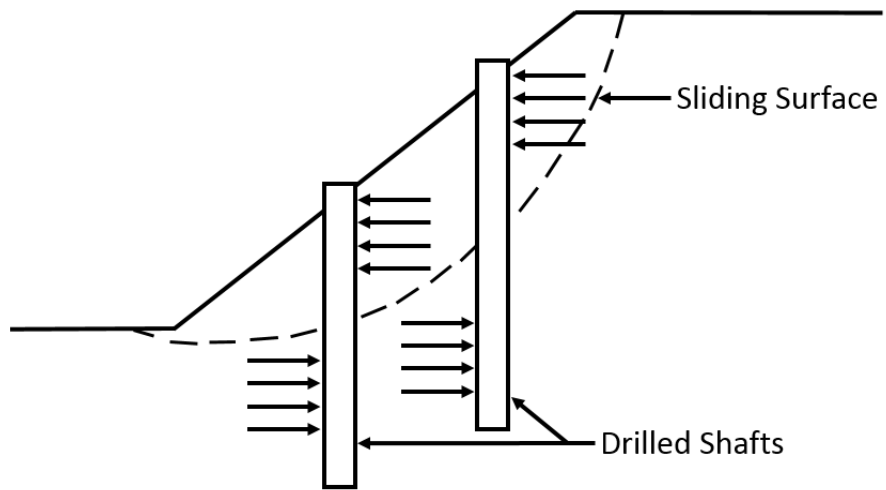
Schematic loading for slope stabilization (from O'Neill and Reese 1999).
